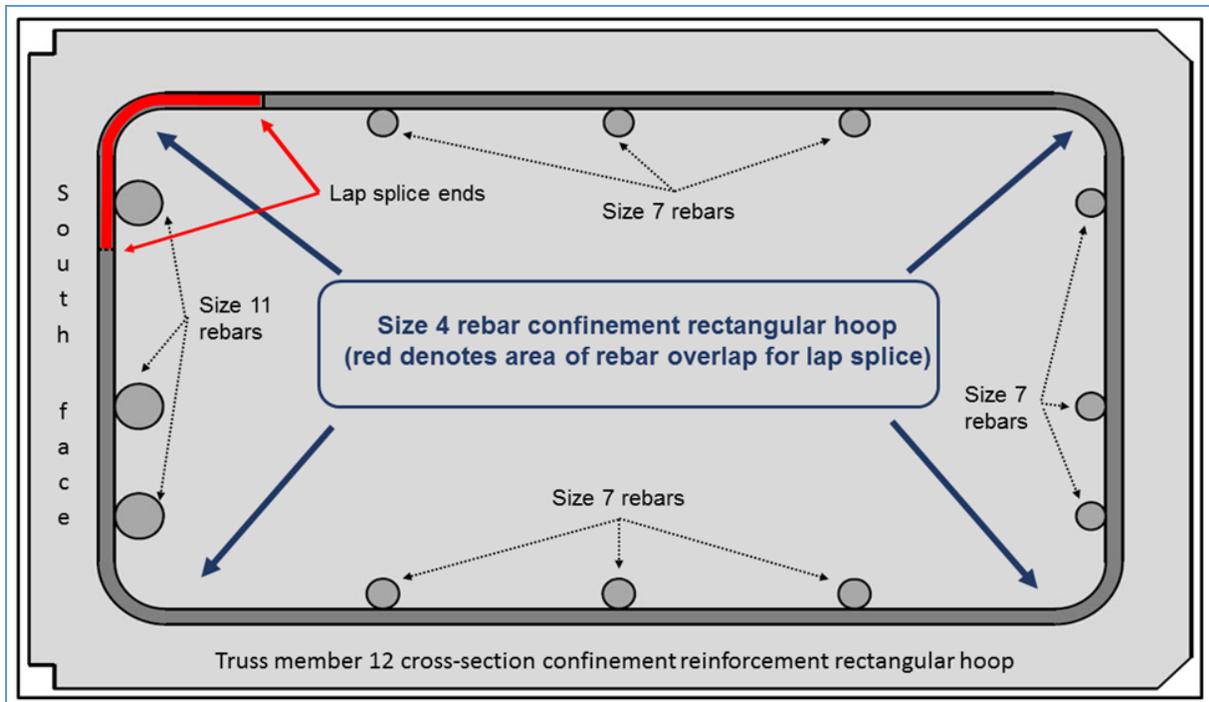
Cross section of truss vertical member 12 concrete-embedded rebar confinement hoop and rebars with lap splice.
